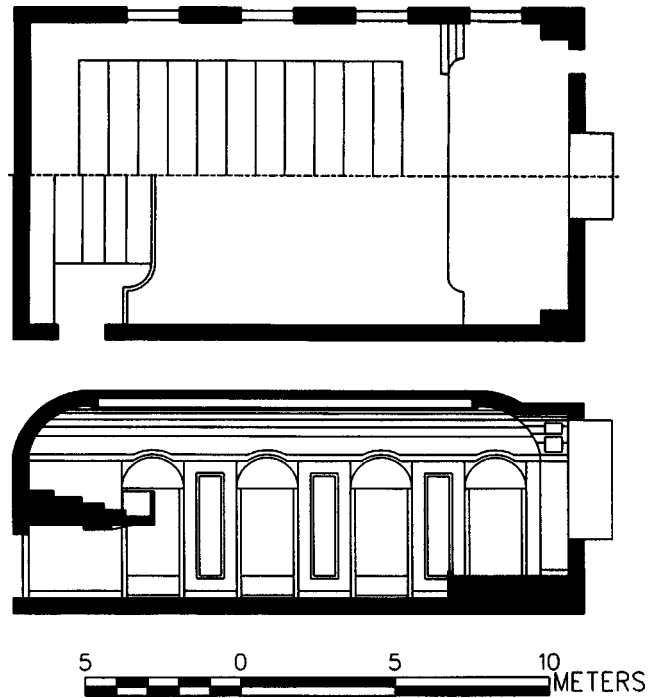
Salzburg, Wienersaal Mozartium, SW, plan and section.
